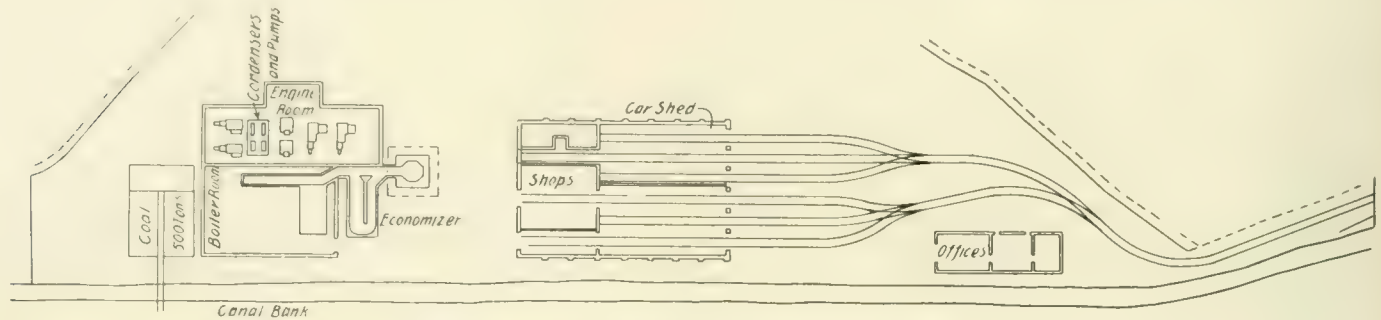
PLAN OF POWER PLANT, SHOPS AND YARDS.
